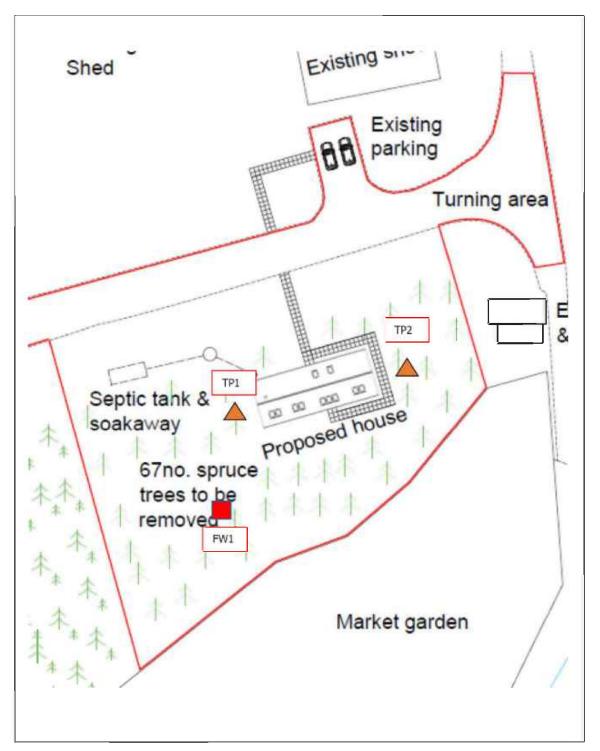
PROPOSED SITE LAYOUT & TEST LOCATION PLAN
